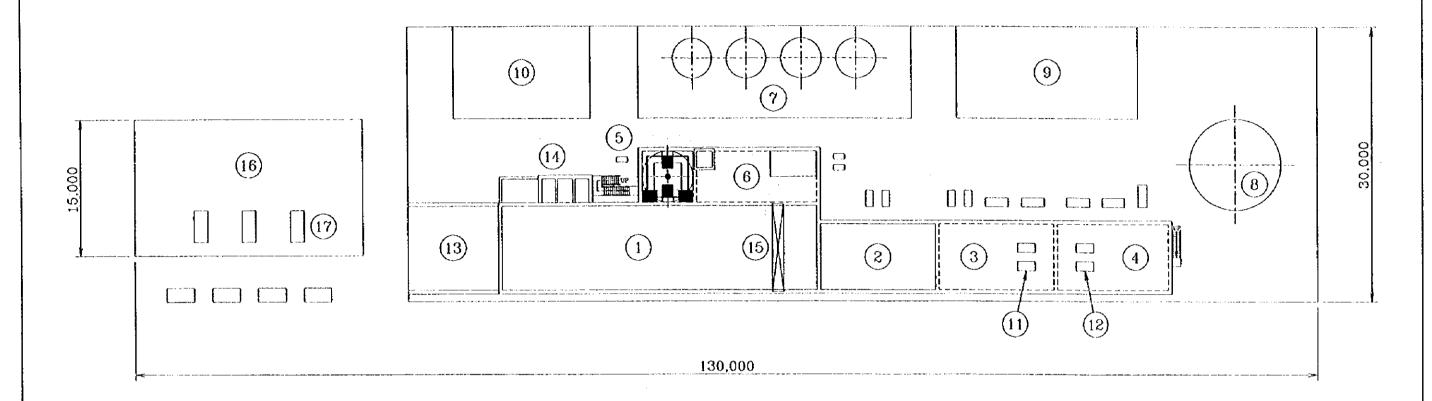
Layout of Desalination Plant and Raw Water Receiving Station
